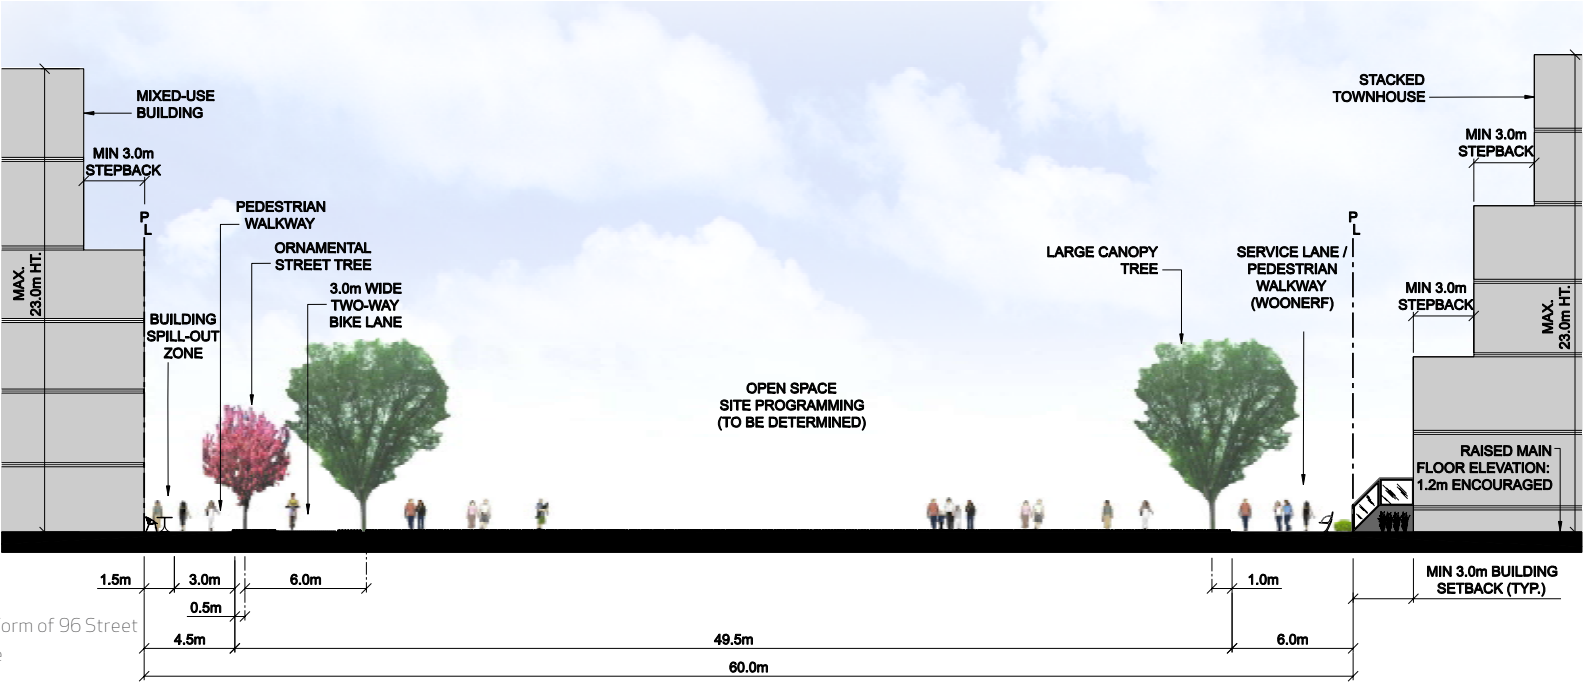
Section: Possible built form of 96 Street from 102A Avenue to 103 Avenue
